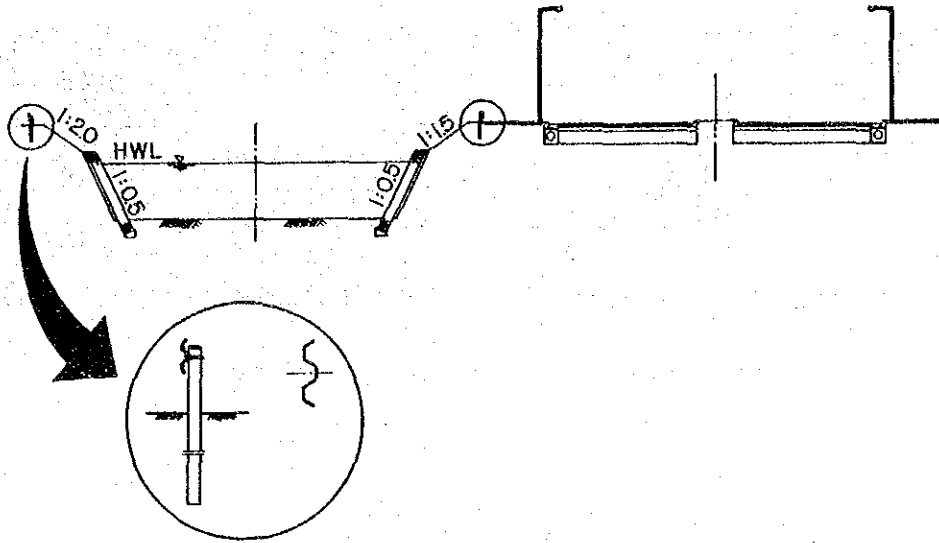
MME. LYNCH AVENUE GUARDRAIL
